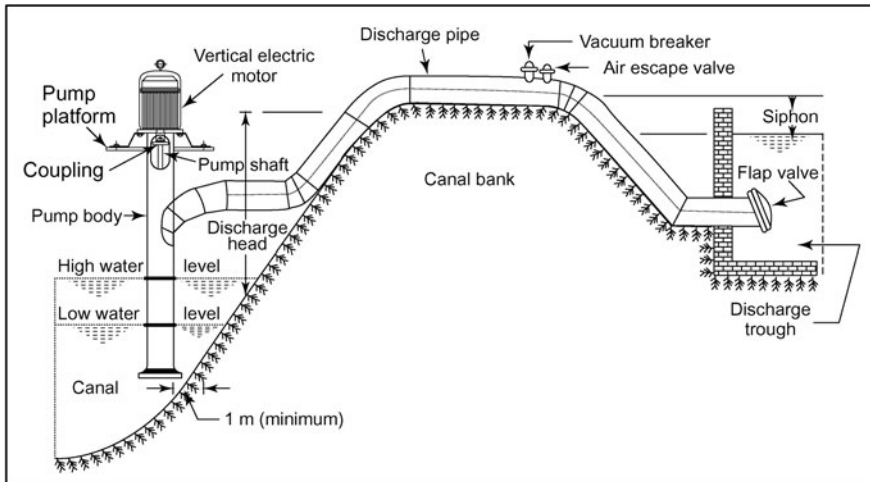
Installation of a propeller pump to lift water from a canal/river over an embankment, taking advantage of siphon action to reduce lift. The masonry tank shown at the outlet end is optional
